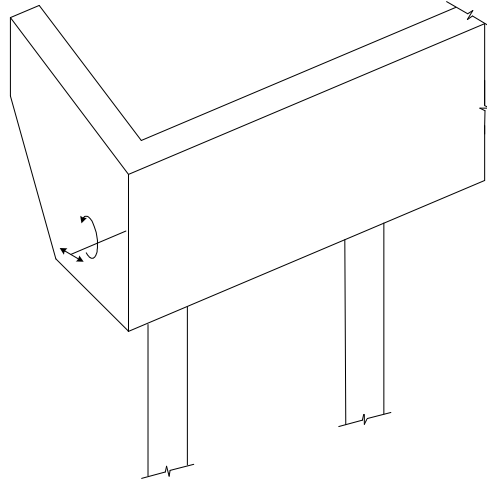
Simple diagram of an FIAB with a cantilevered flared wingwall
